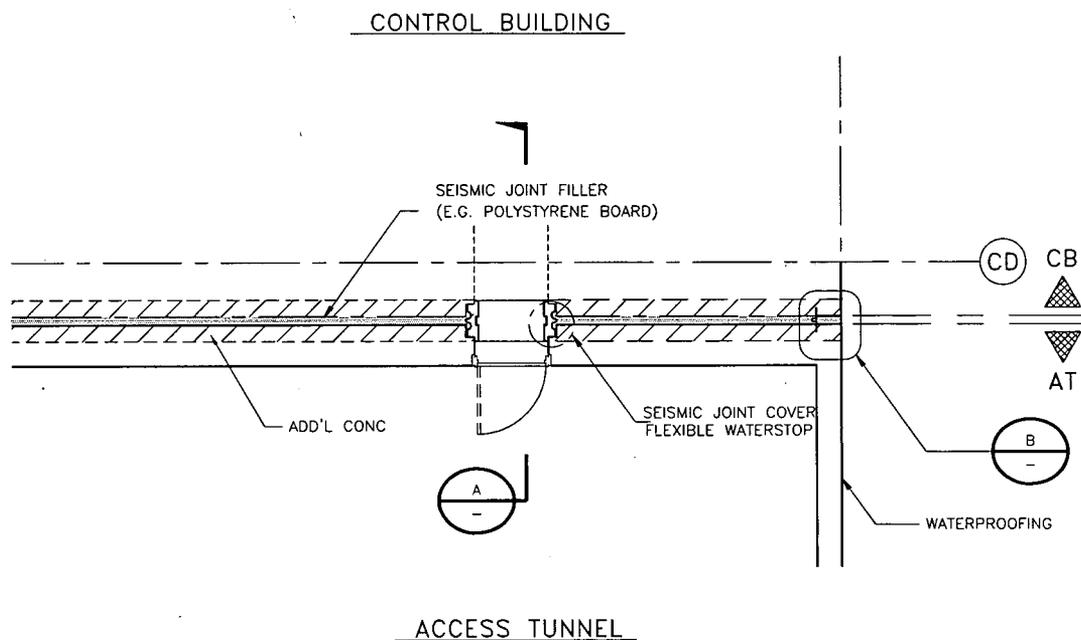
(1) Typical Sketch of Waterproofing at Personnel Access Opening
